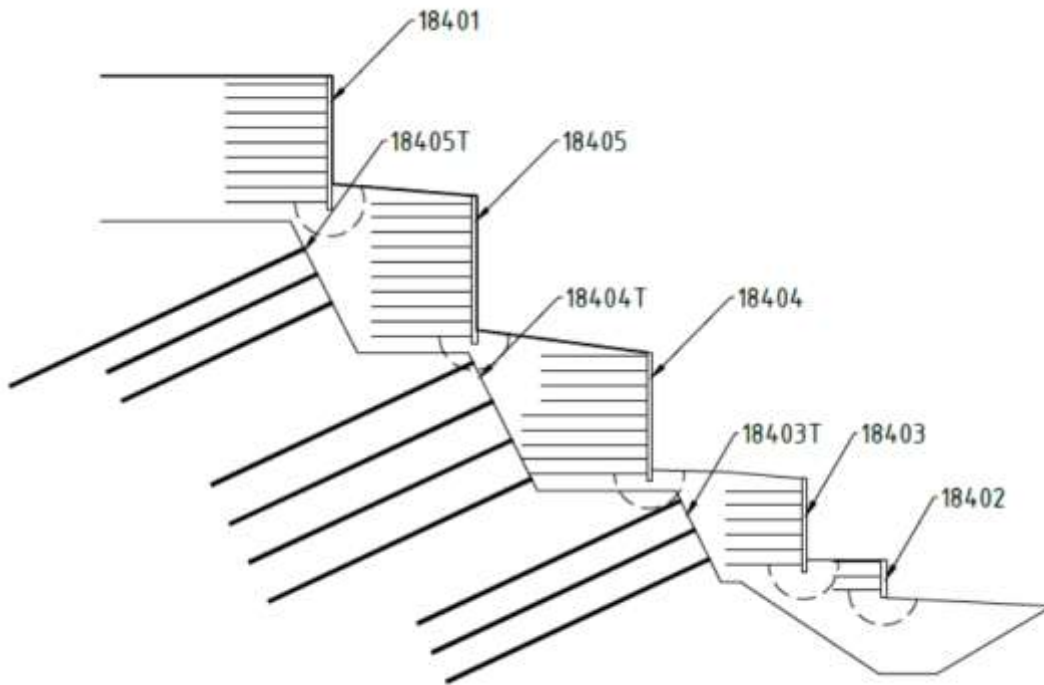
Hybrid Soil-Nail MSE Wall Solution for St Jacques-Pullman Walls
